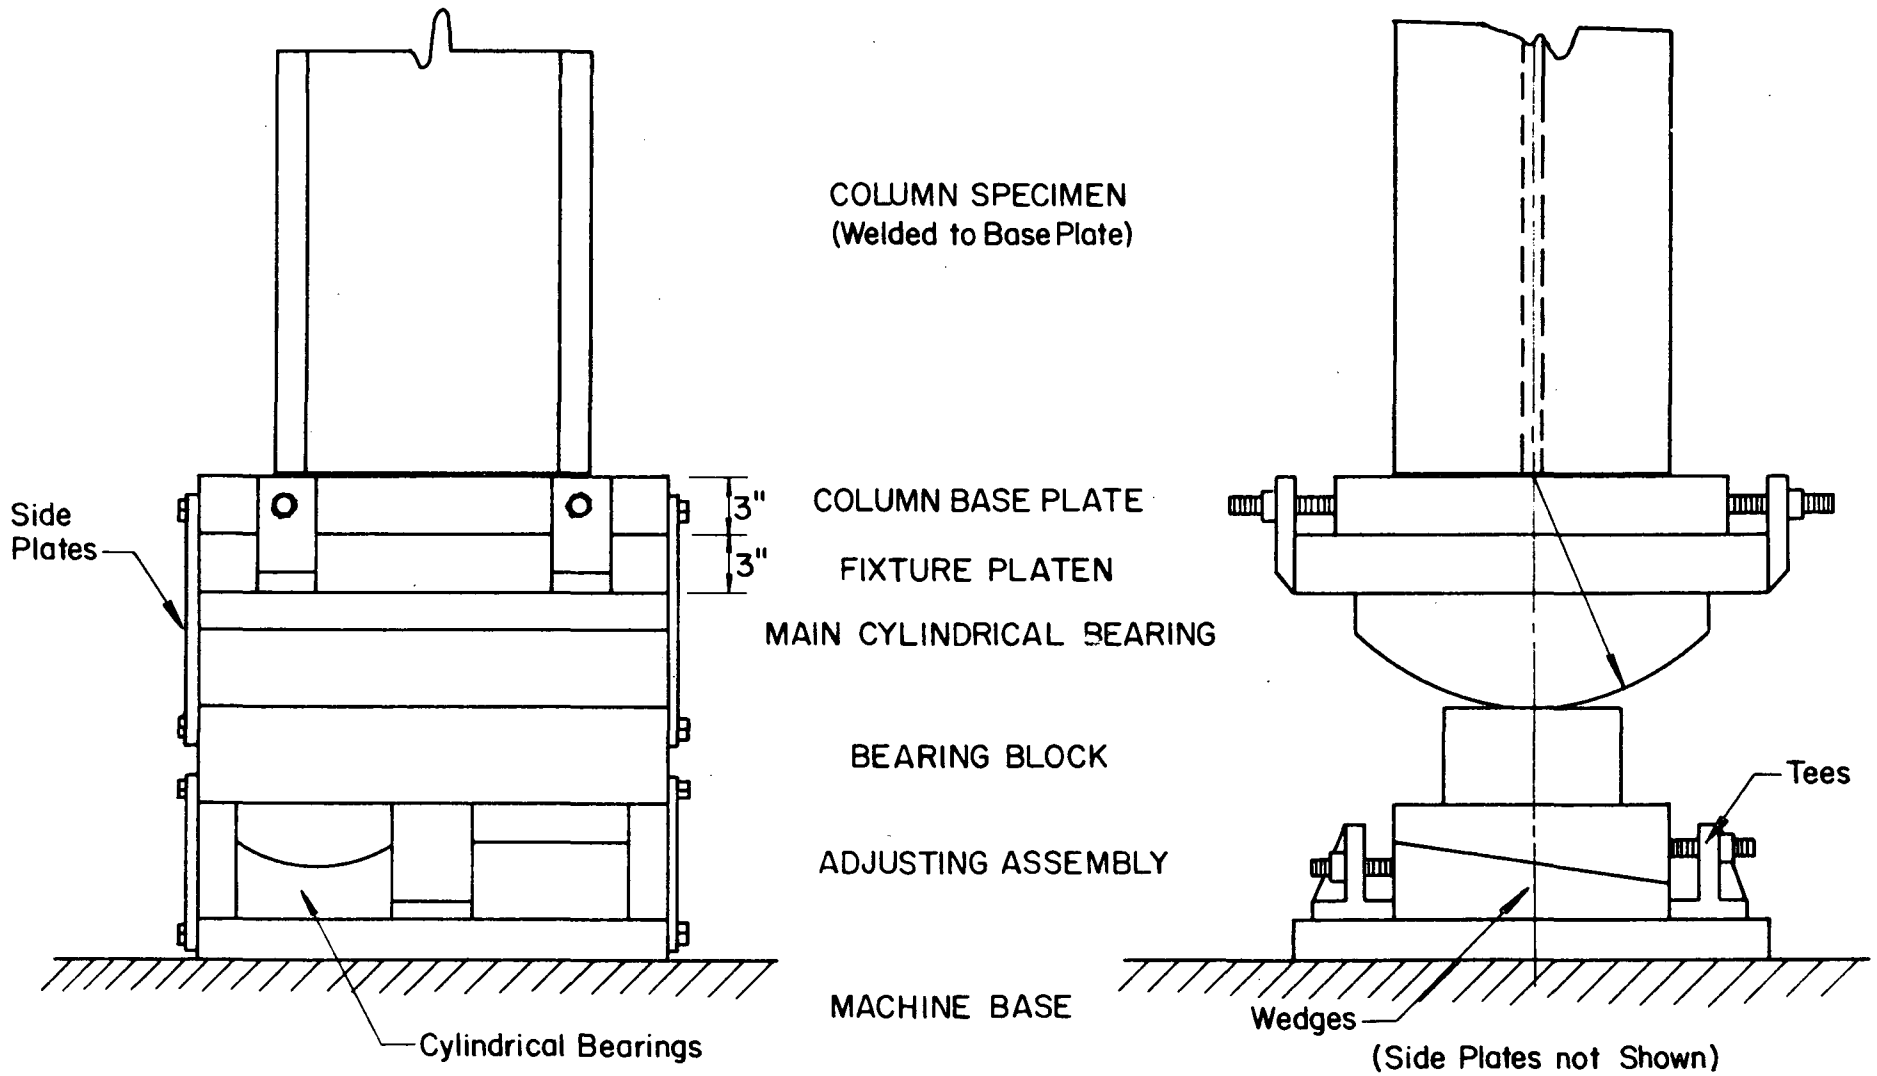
STANDARD COLUMN END FIXTURE AT FRITZ ENGINEERING LABORATORY
